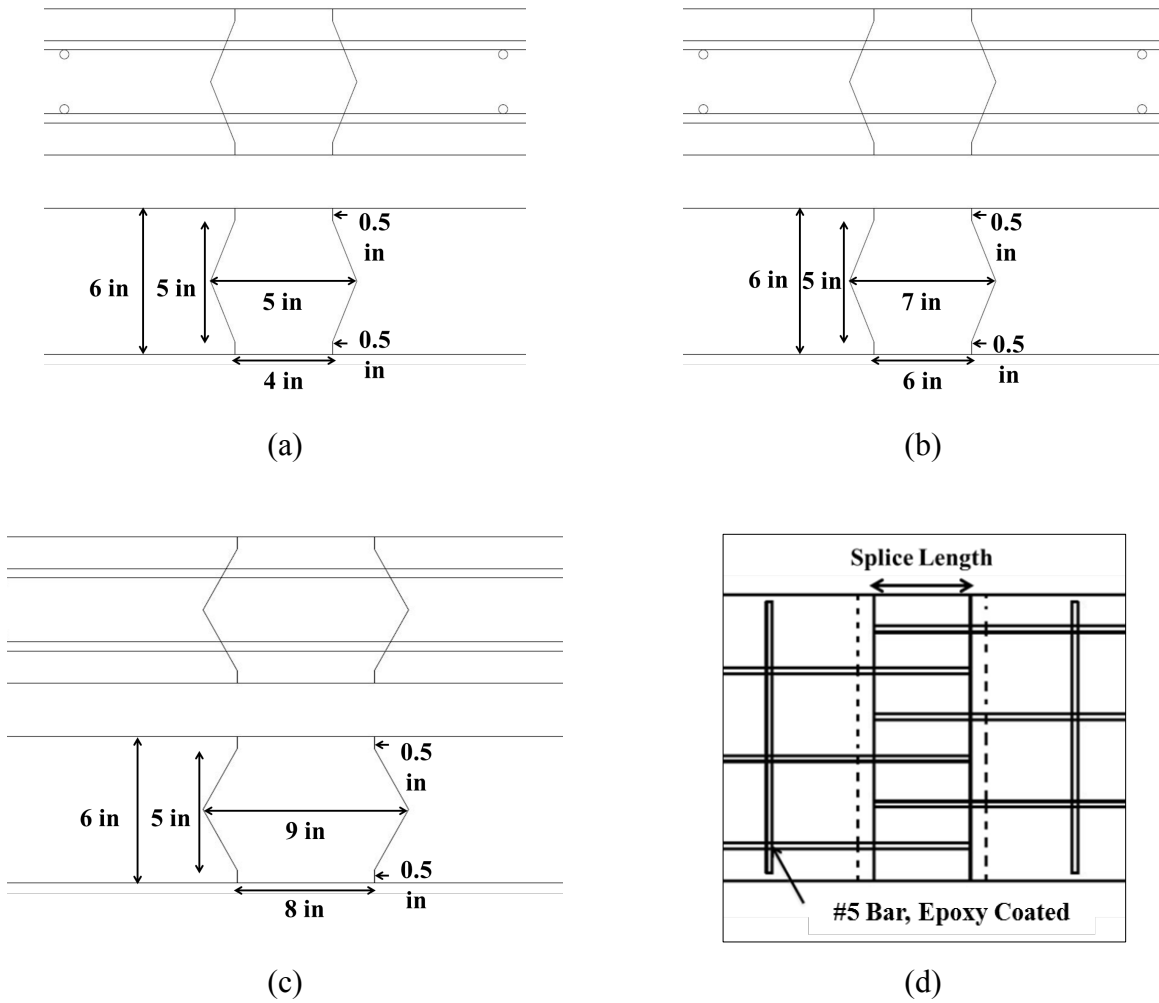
Joint Shape Details for the 4 in (a), 6 in (b) 8 in (c) joint, Lap Splice Connection Detail (d)
